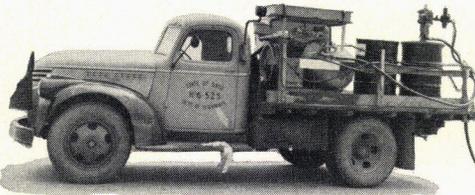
General view of truck completely equipped for this method of joint resealing. This truck will also carry the roter.
